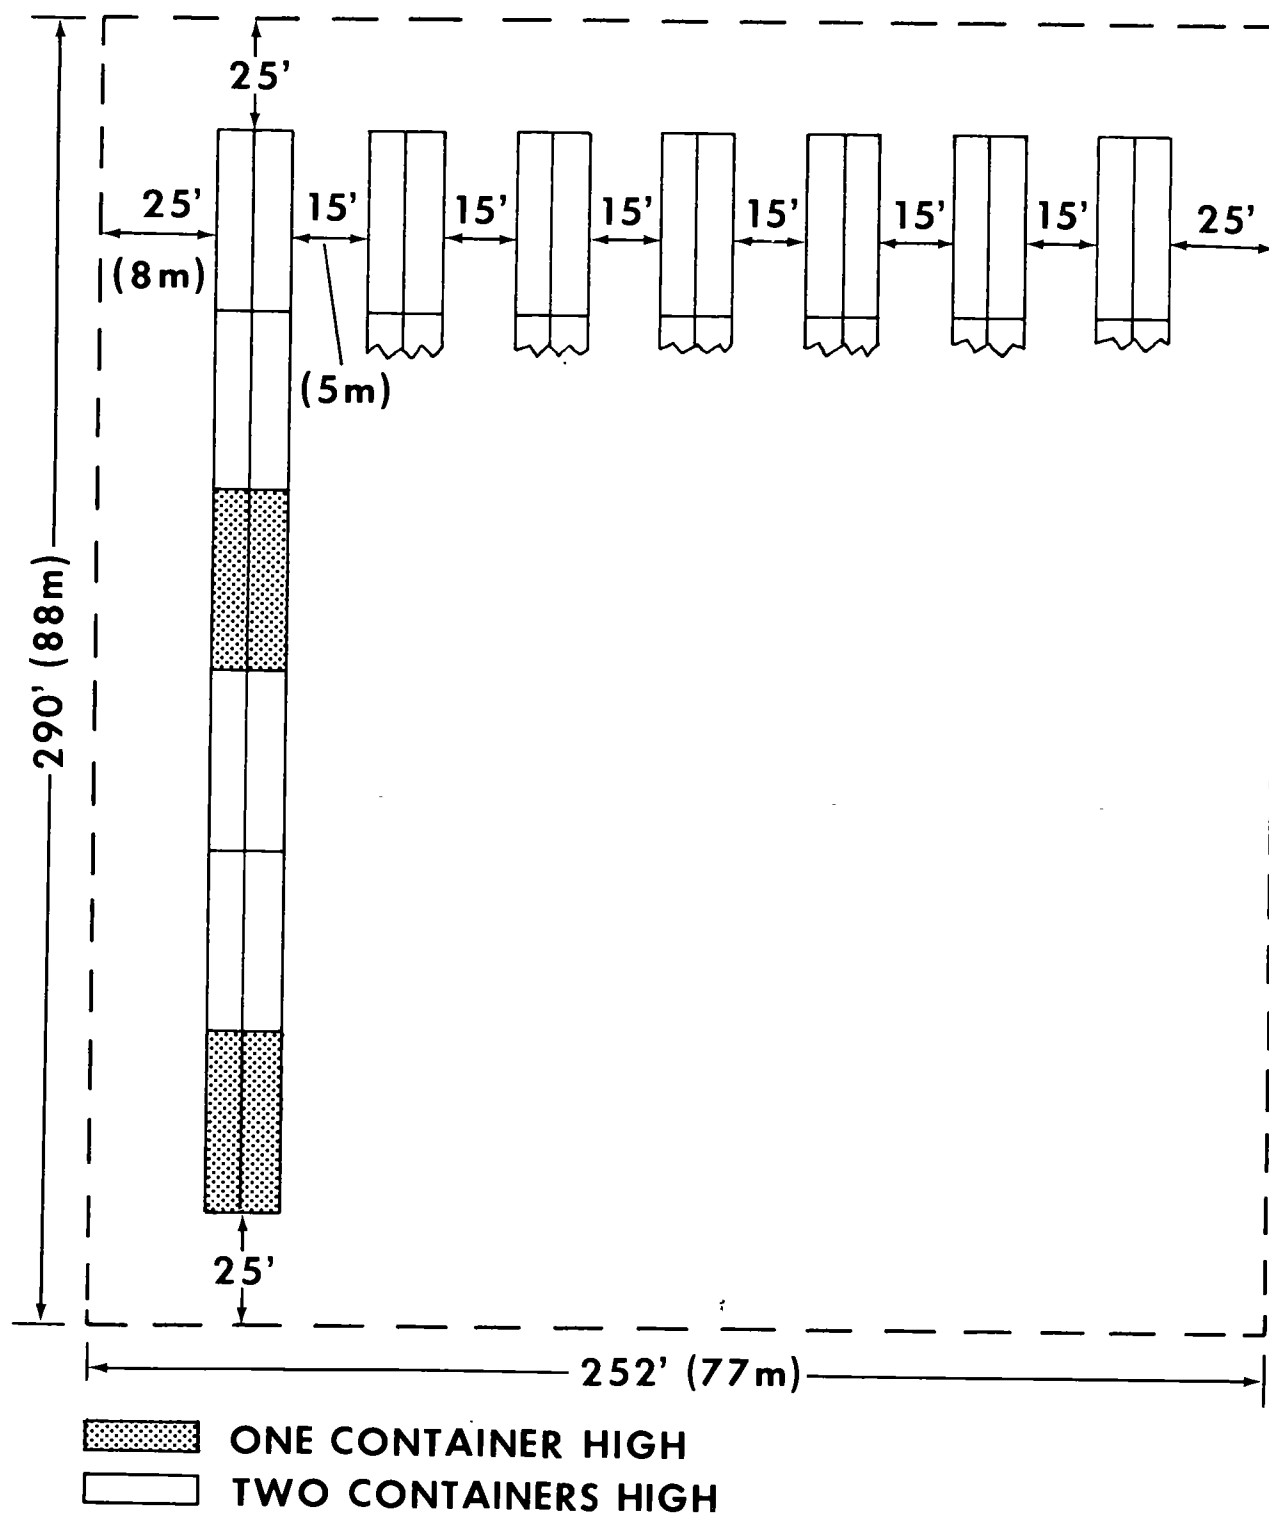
Cluster plan for sideloader turret stacking of 35-foot containers—20-foot working aisle and 60-foot intersecting aisle.
